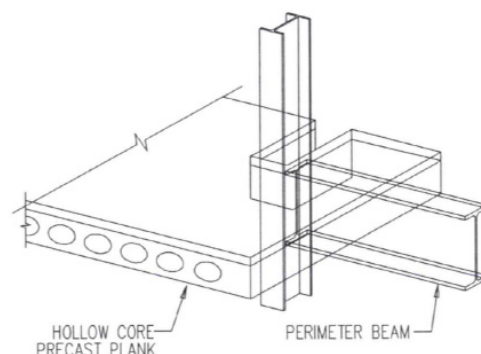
Precast Plank and Steel Frame Isometric Diagram
